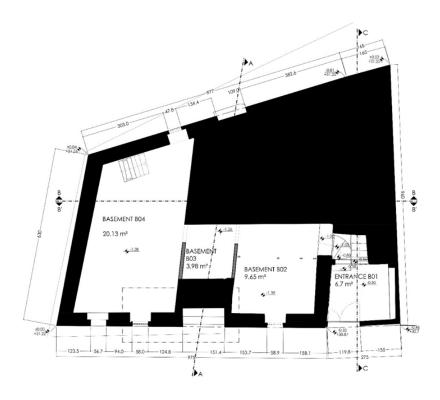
Basement floor plan of the house in Basmane (Source: Düzalan and Açan, 2016)
